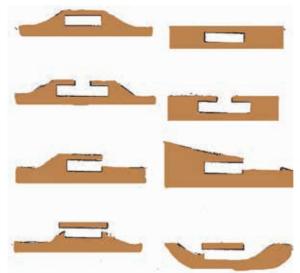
Left, earth sheltered building sections (on ground level); Right, earth covered building sections (Under ground level) (Labs, 1975)
